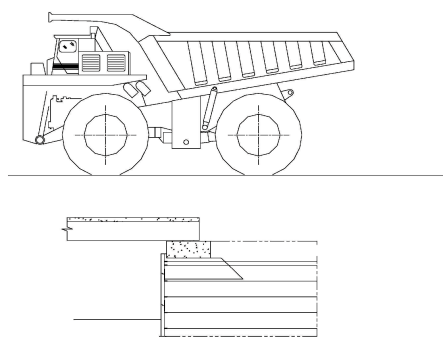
A 700 ton load of truck and ore crosses the bridge and MSE abutment wall over an uninterrupted conveyor. Figure is drawn to scale.
